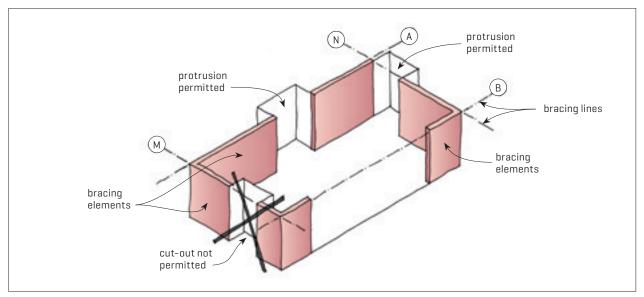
Ceiling diaphragm protrusions and cut-outs.
